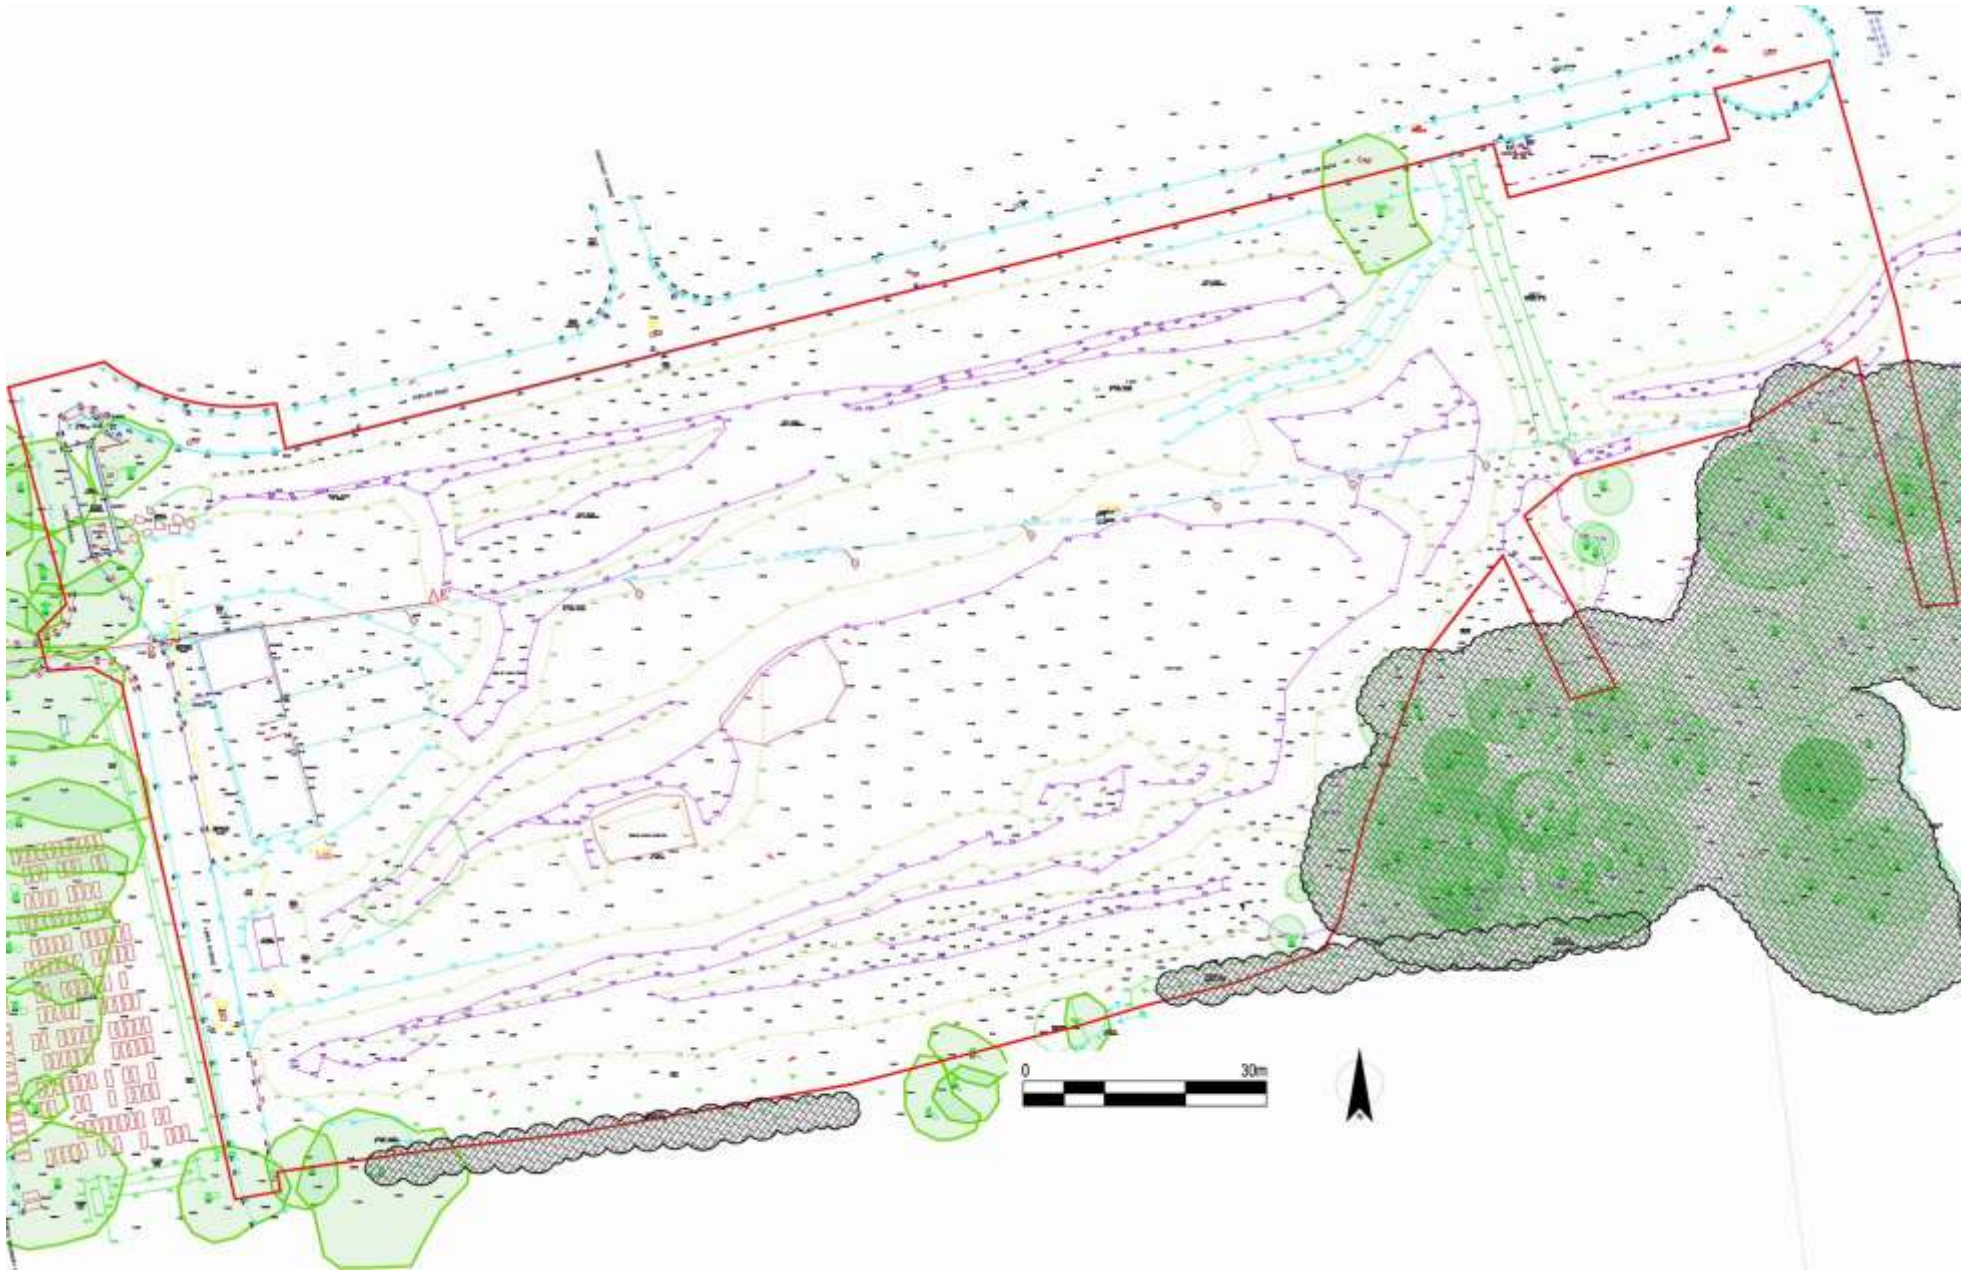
Existing site plan. Adapted from Harrison design development, Drawing no: 069-01-01 A
